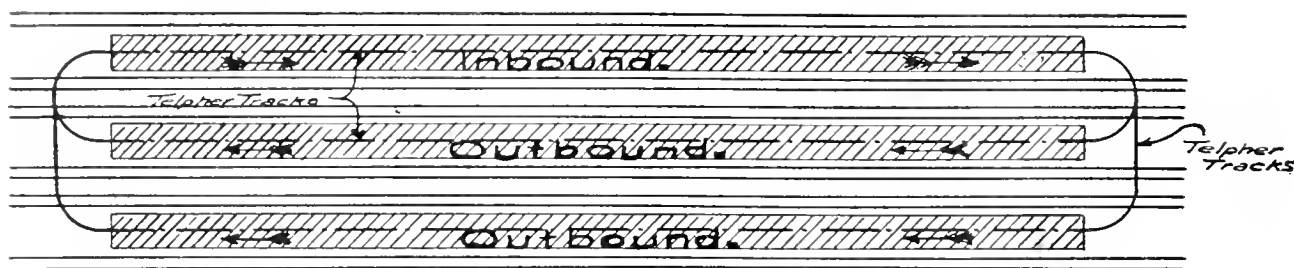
Plan Showing Telpher Tracks at Bergen, Sheds of Erie Railroad.
